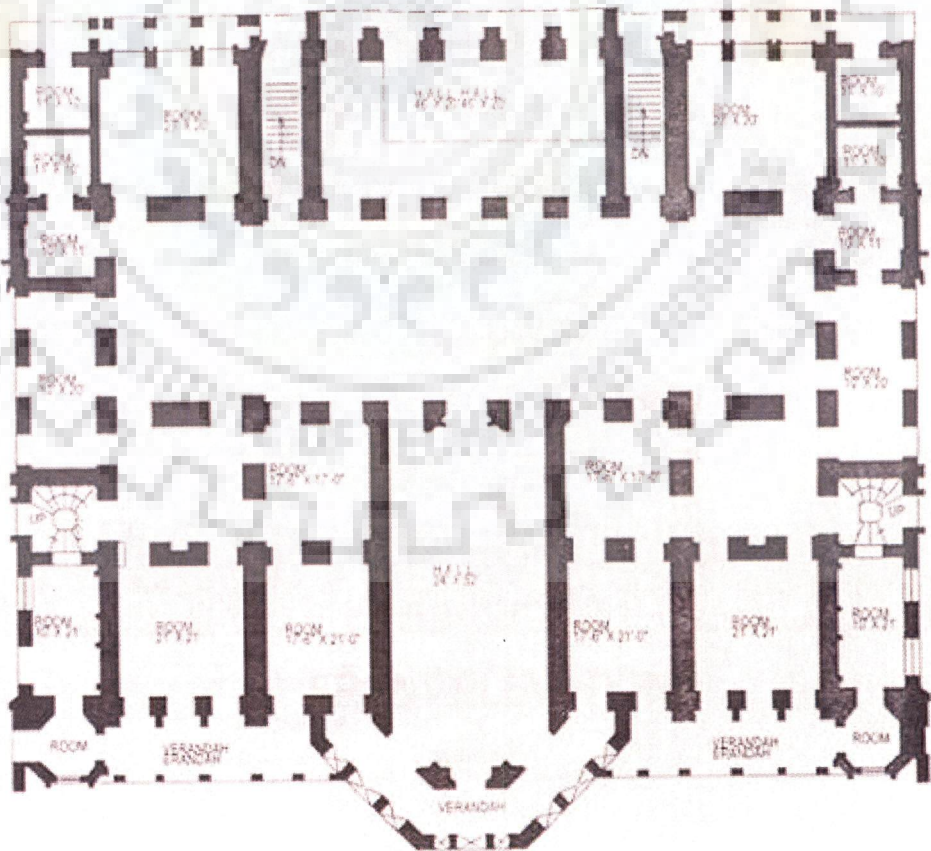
First Floor Plan of Roshan ud Daula Kothi
